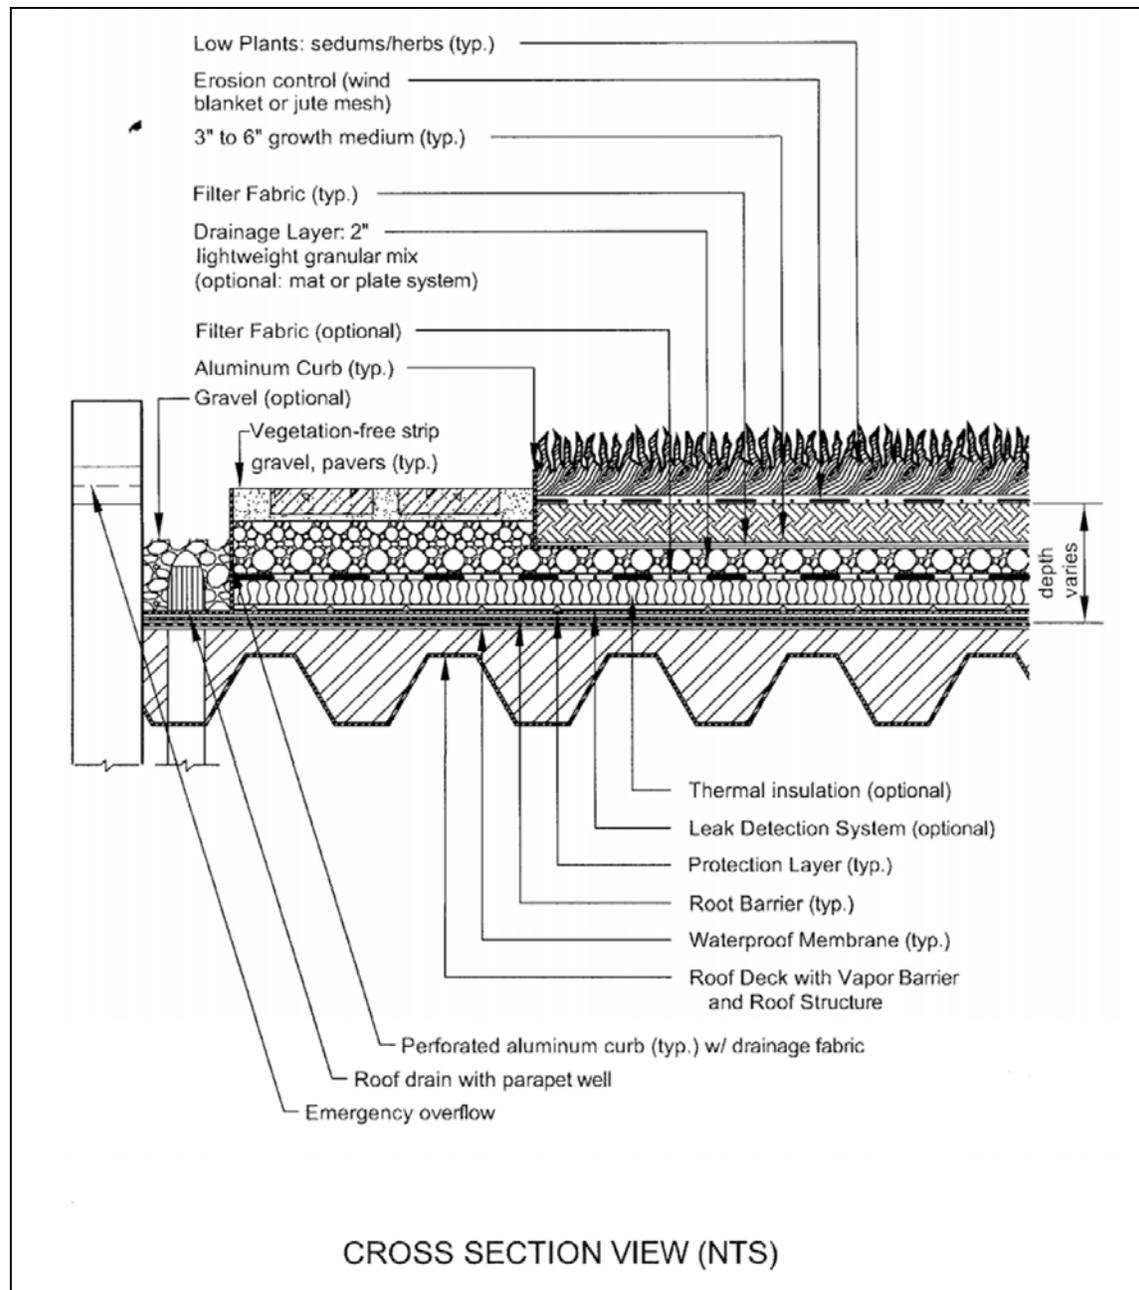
Extensive Vegetated Roof Typical Section (Source: NVRC, 2007).
